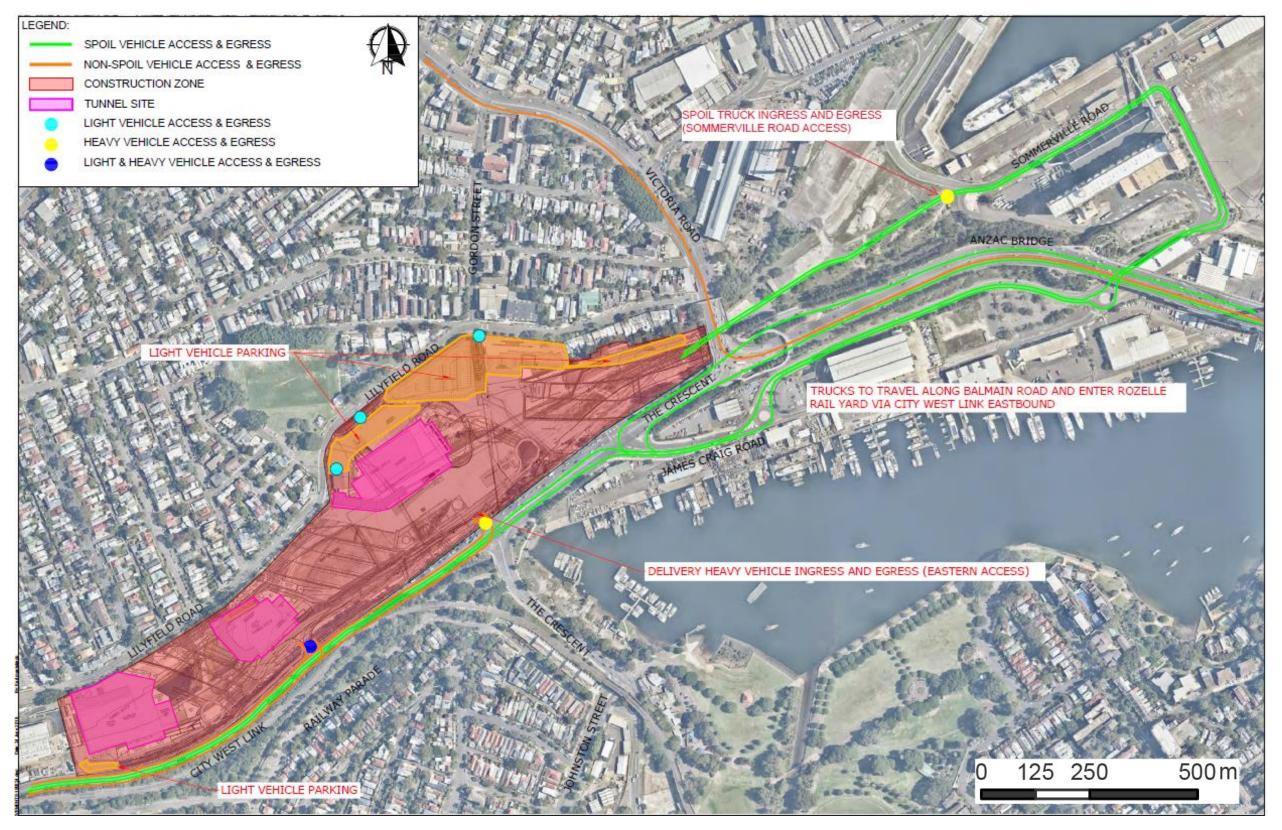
Haulage Routes via the Rozelle Civil and Tunnel Site (C5)
